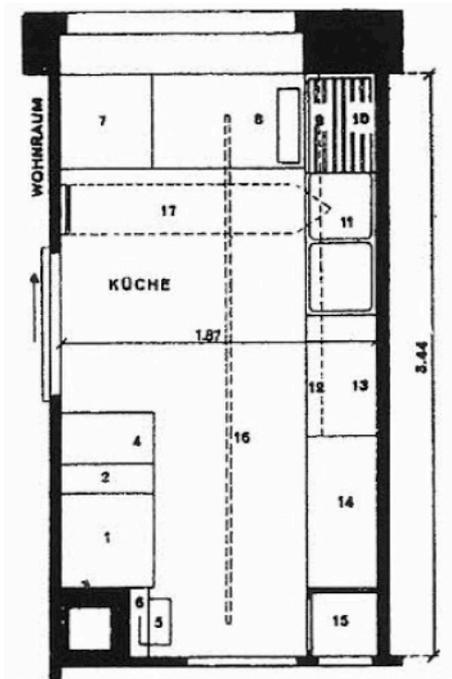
Schütte-Lihotzky, *Frankfurt Kitchen* (1926). Floor plan.
